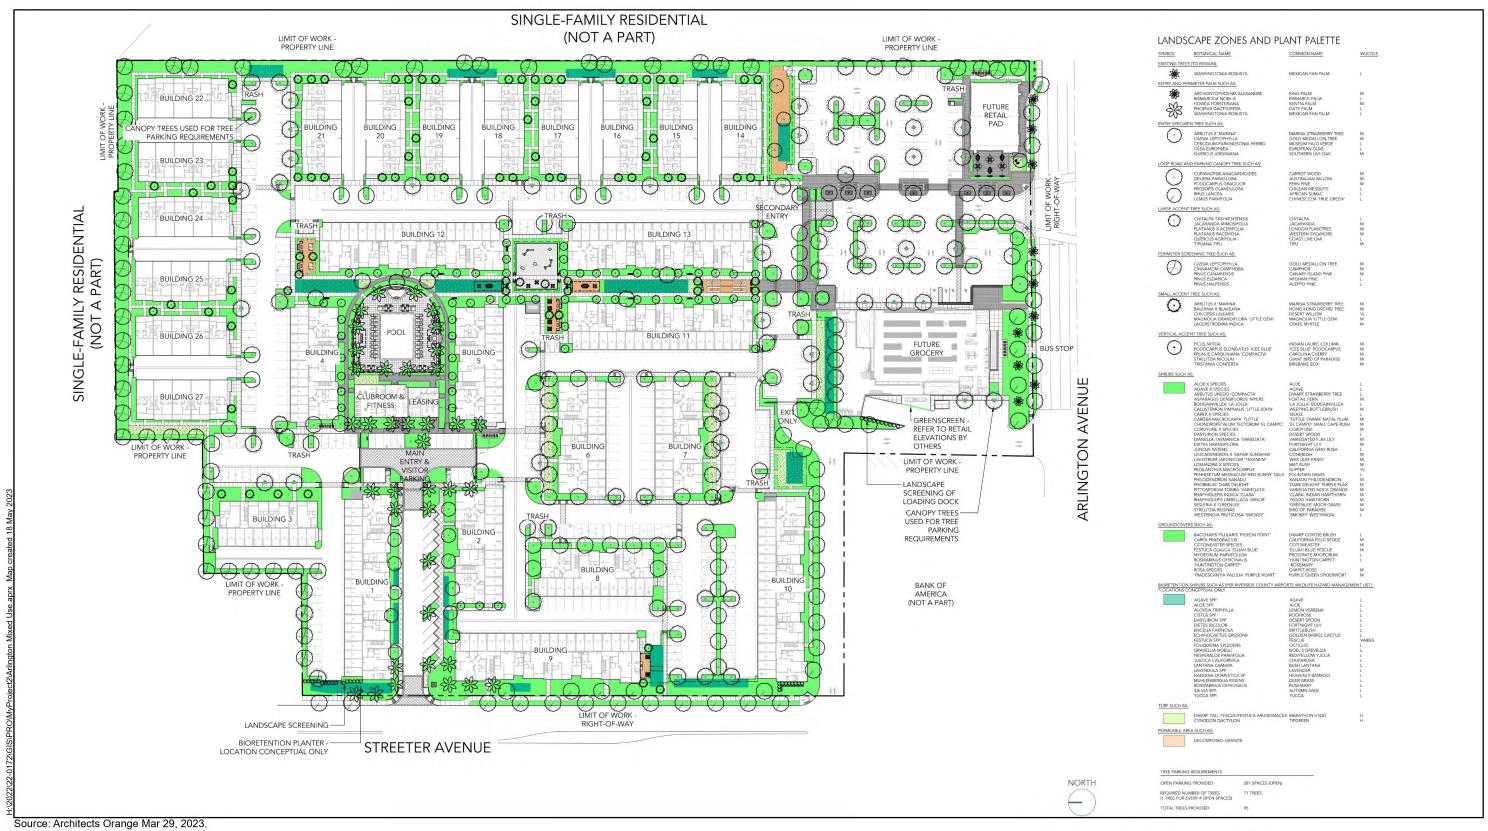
Landscape Planting Plan Arlington Mixed Use
